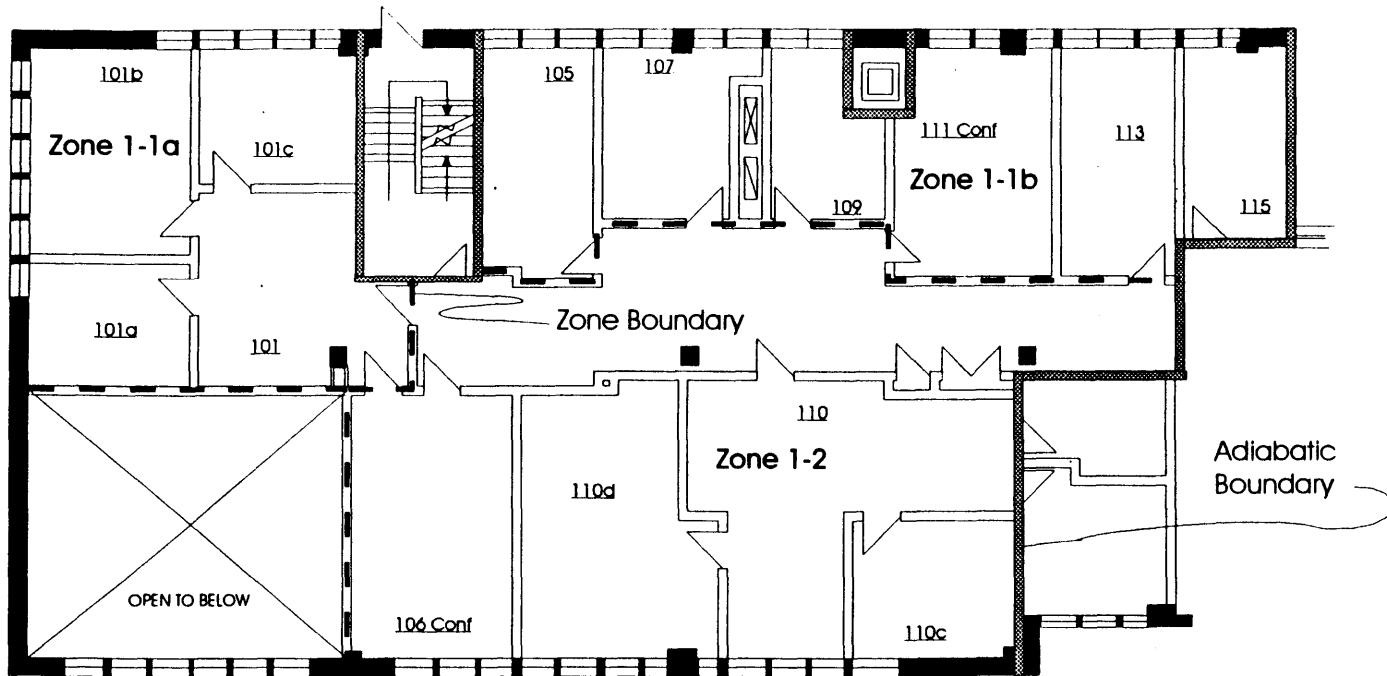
Building E51 - First Floor Level Zoning Option 1A
